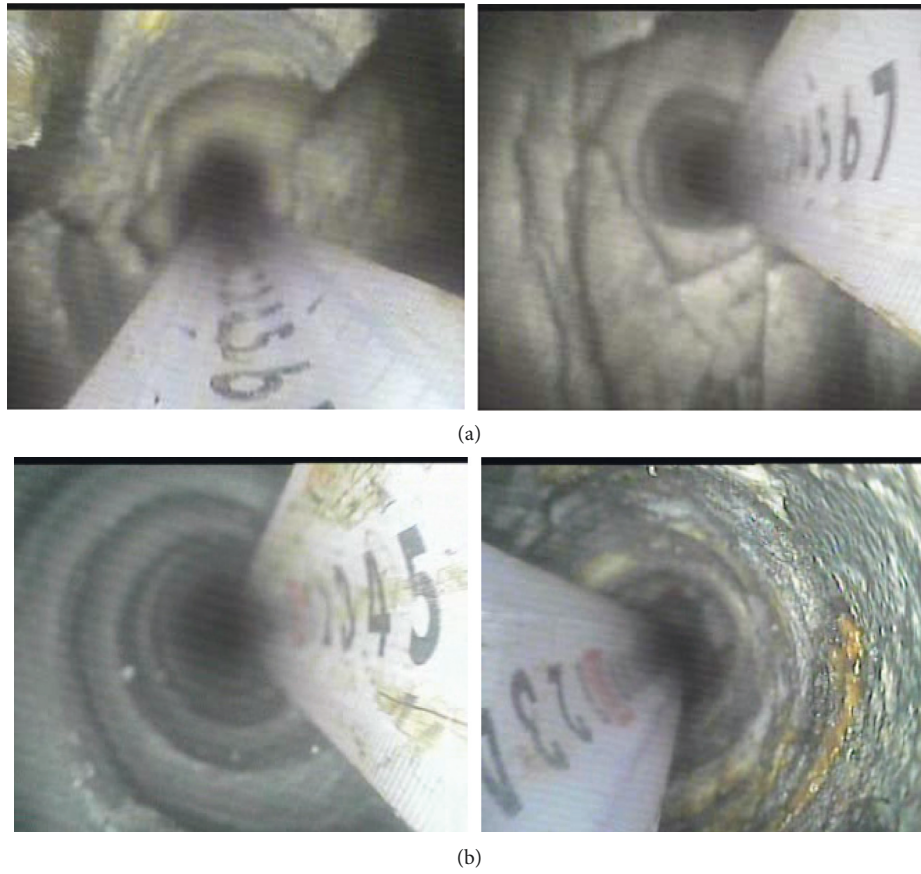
The roof of water pump house surrounding rock peeping results. (a) Broken rock mass. (b) More complete rock mass.
